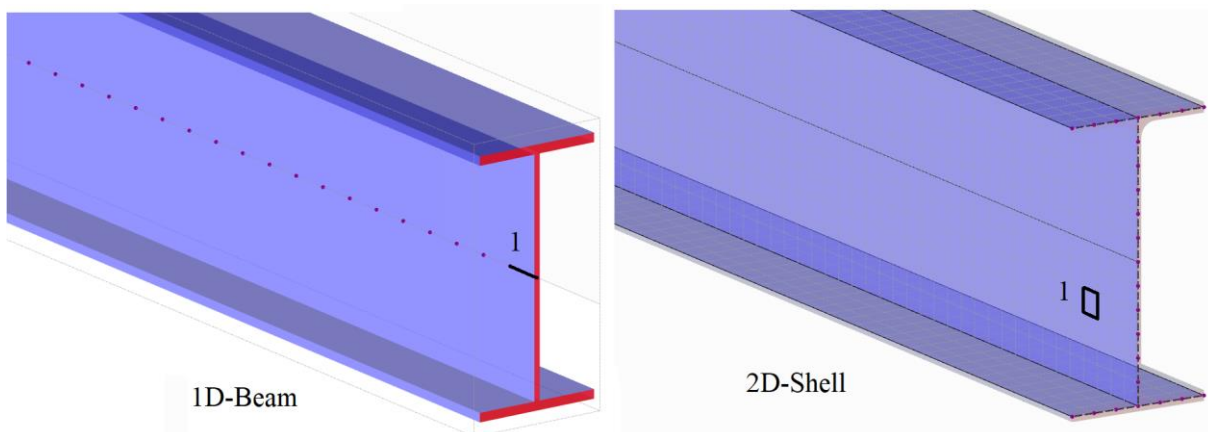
Open profiles: (Left) 1D-beam element and (Right) 2D-shell element
